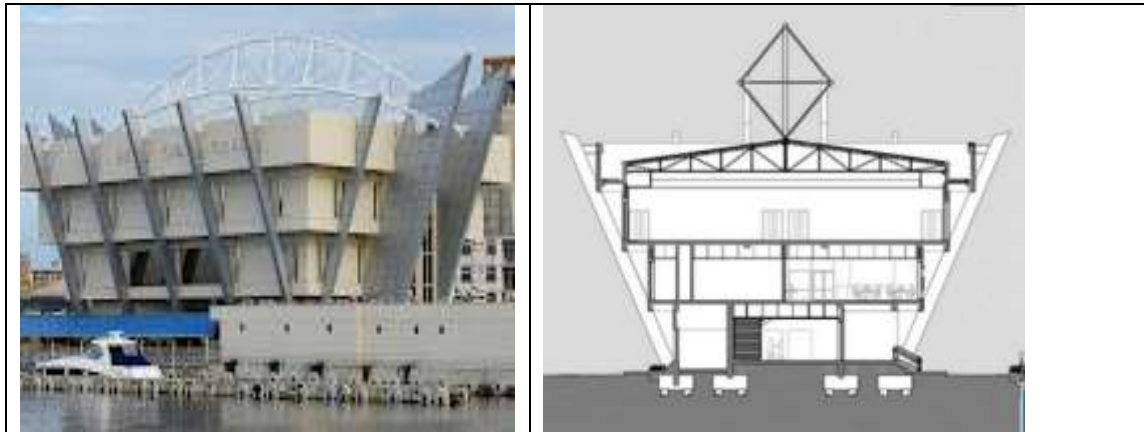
Civic Centre Photo and Section, courtesy James Cubitt Architects
